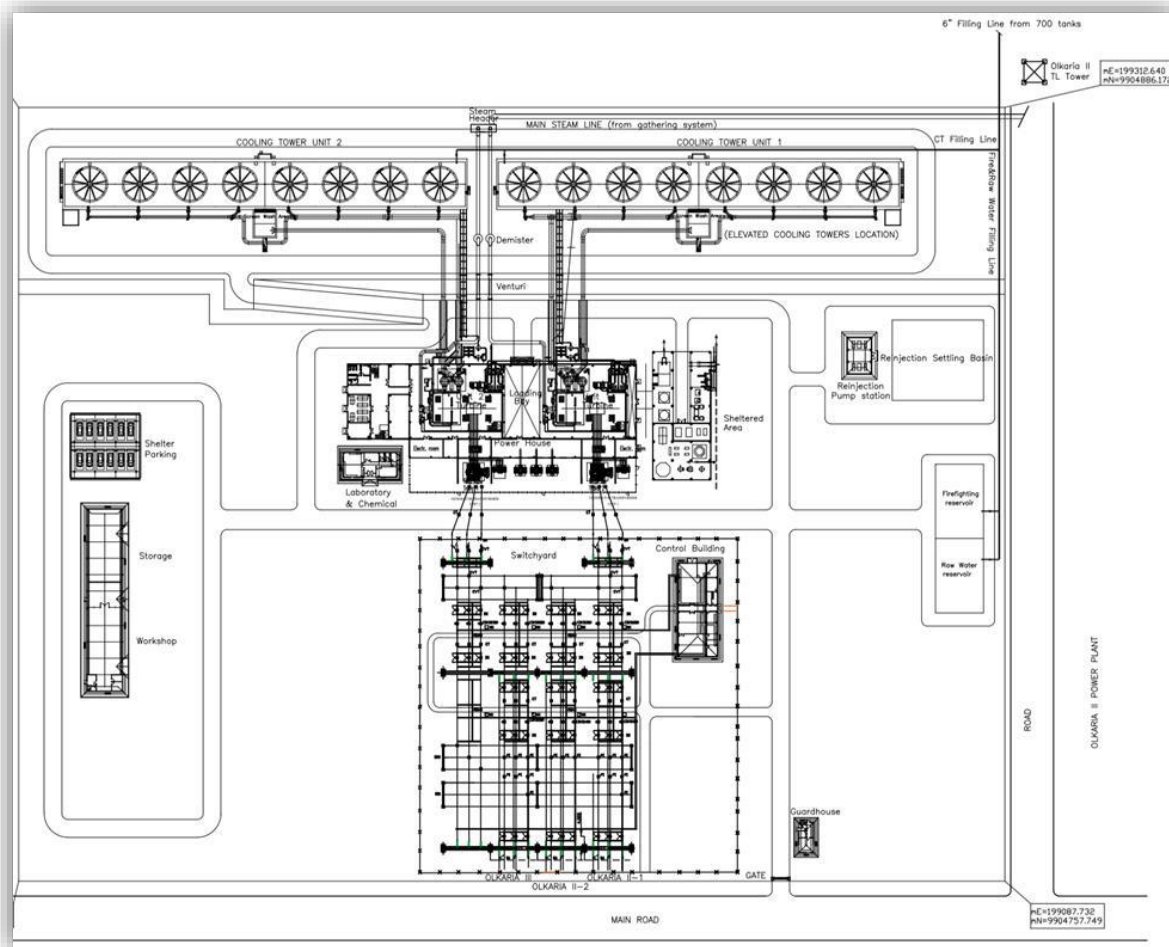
Layout of the power plant: powerhouse and ancillary buildings
